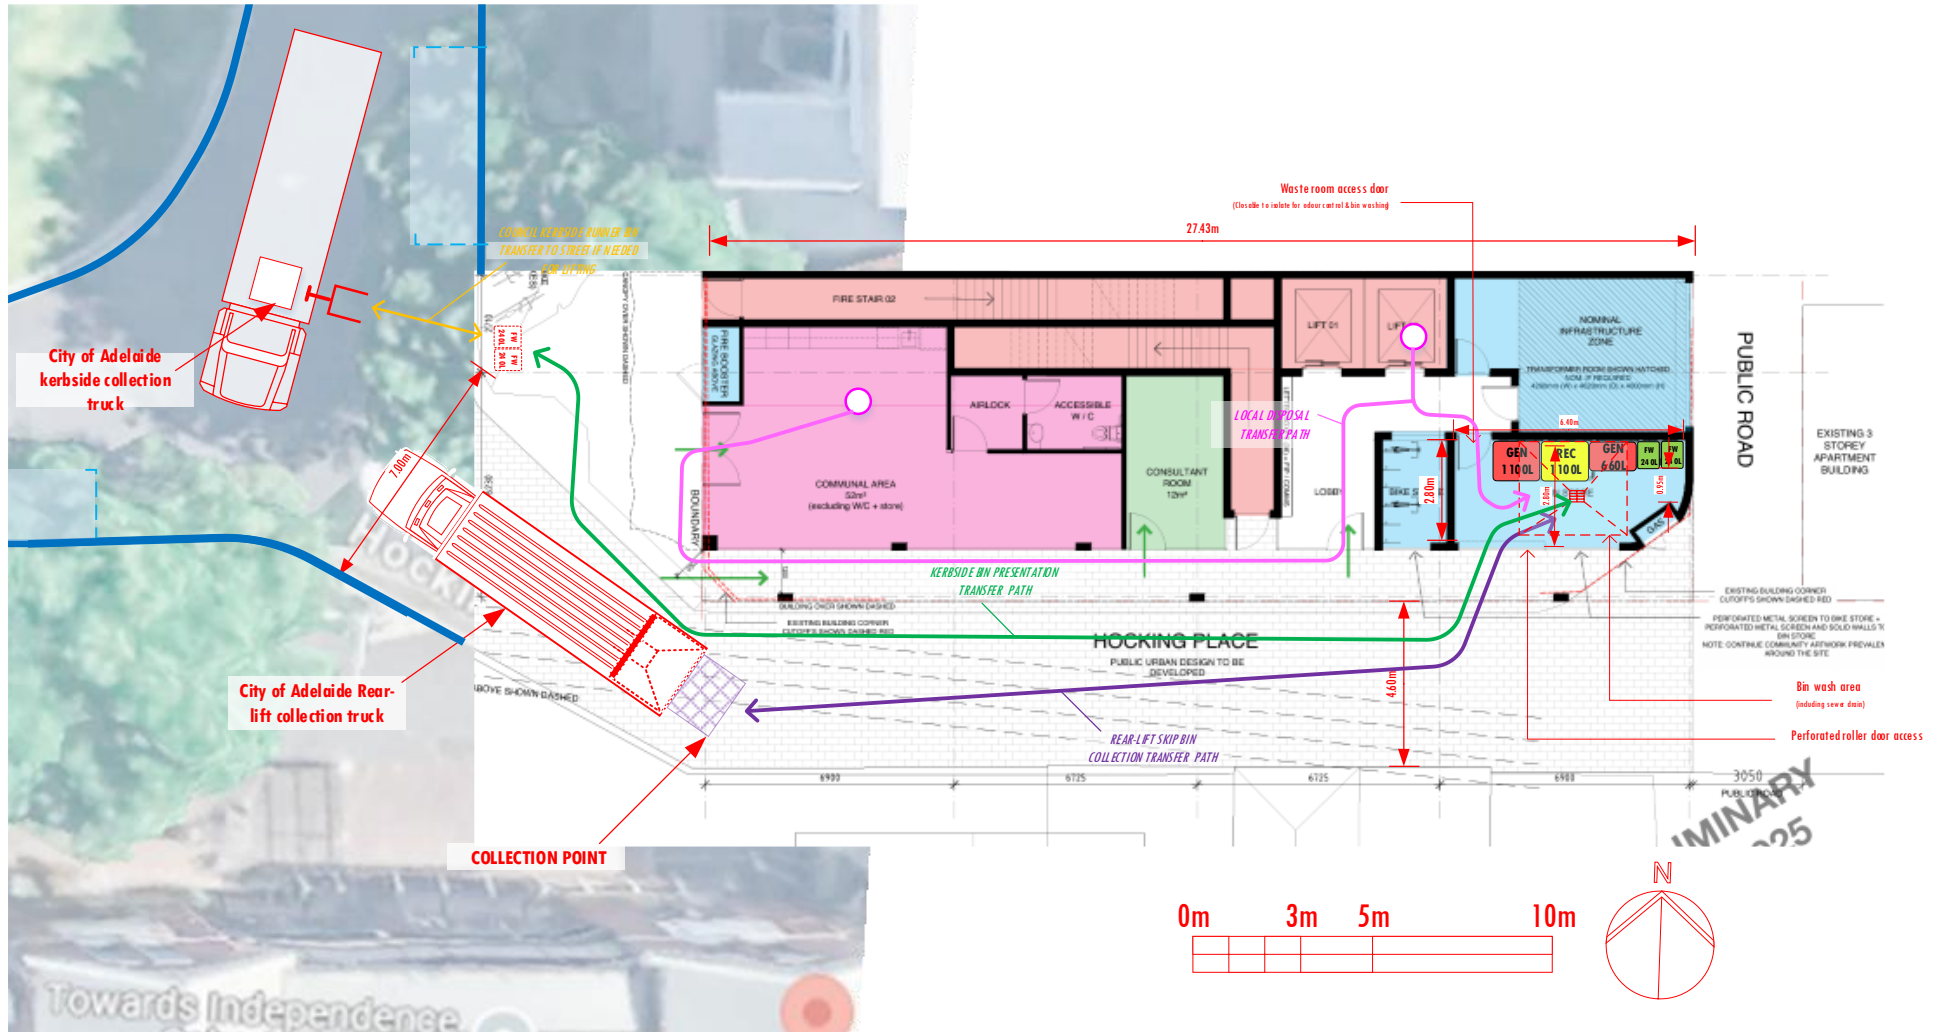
Ground floor site plan for the Development showing the waste bin room with bin overlay and illustrating the expected Ground level disposal paths for (resident) disposal and (Council) collection from this room. Ground level plan reproduced from design plans by Project Architect (Tectvs Architecture, May 2025).
